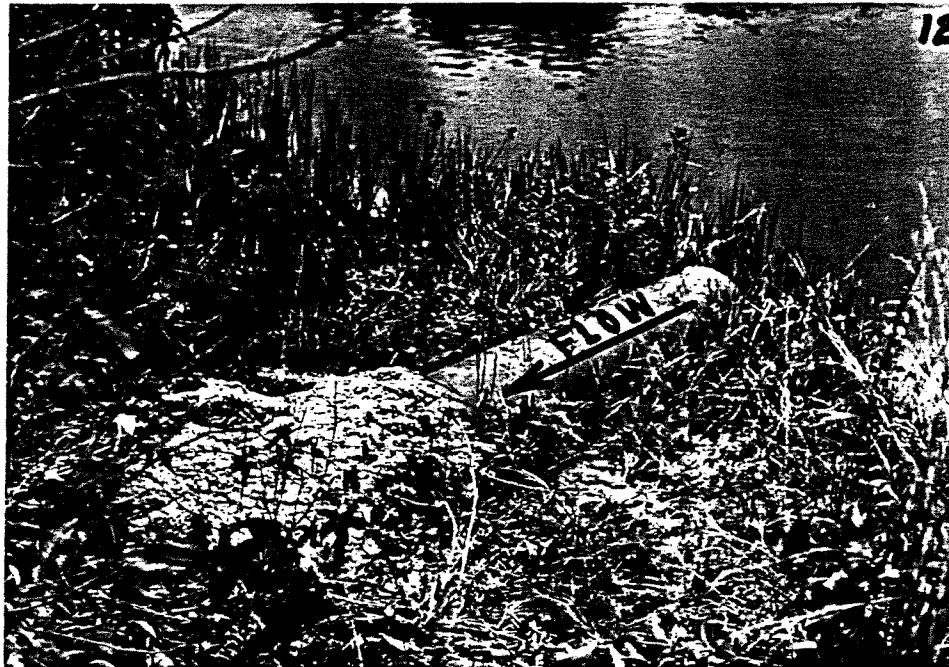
The inlet end of the 16-inch I. D., service spillway conduit. This is the only spillway facility for the structure.
